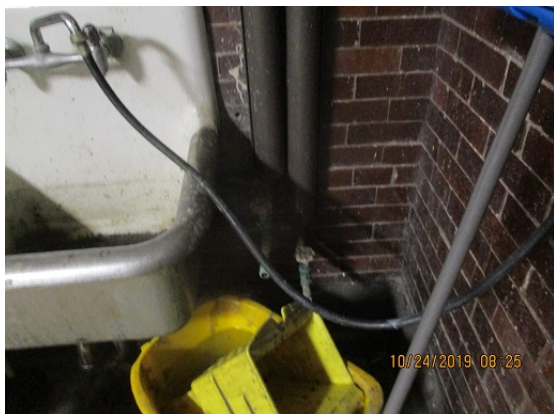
Cracks and Exposed Ends on Pipe Insulation Close Up 1
